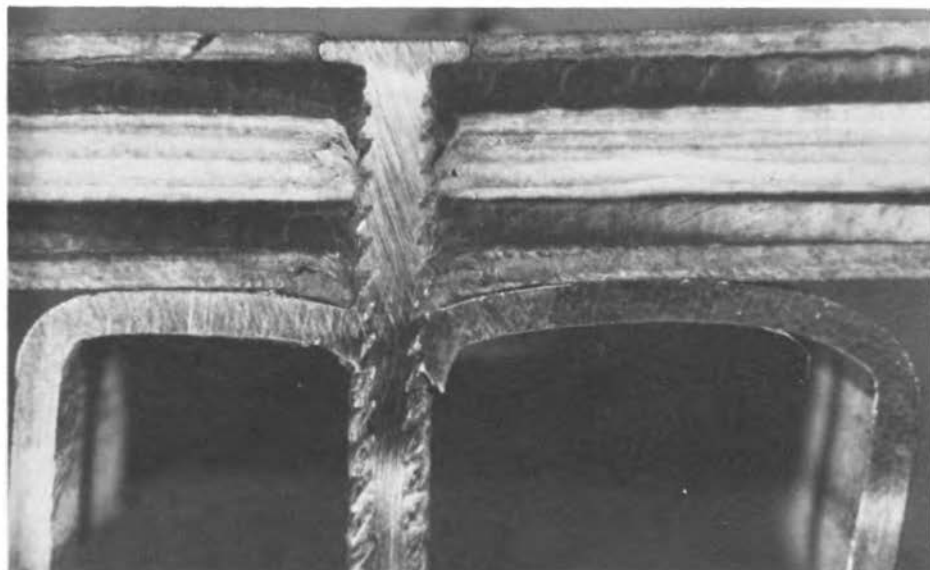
SECTION OF NAIL FASTENING 1-1/2" PLYWOOD TO
